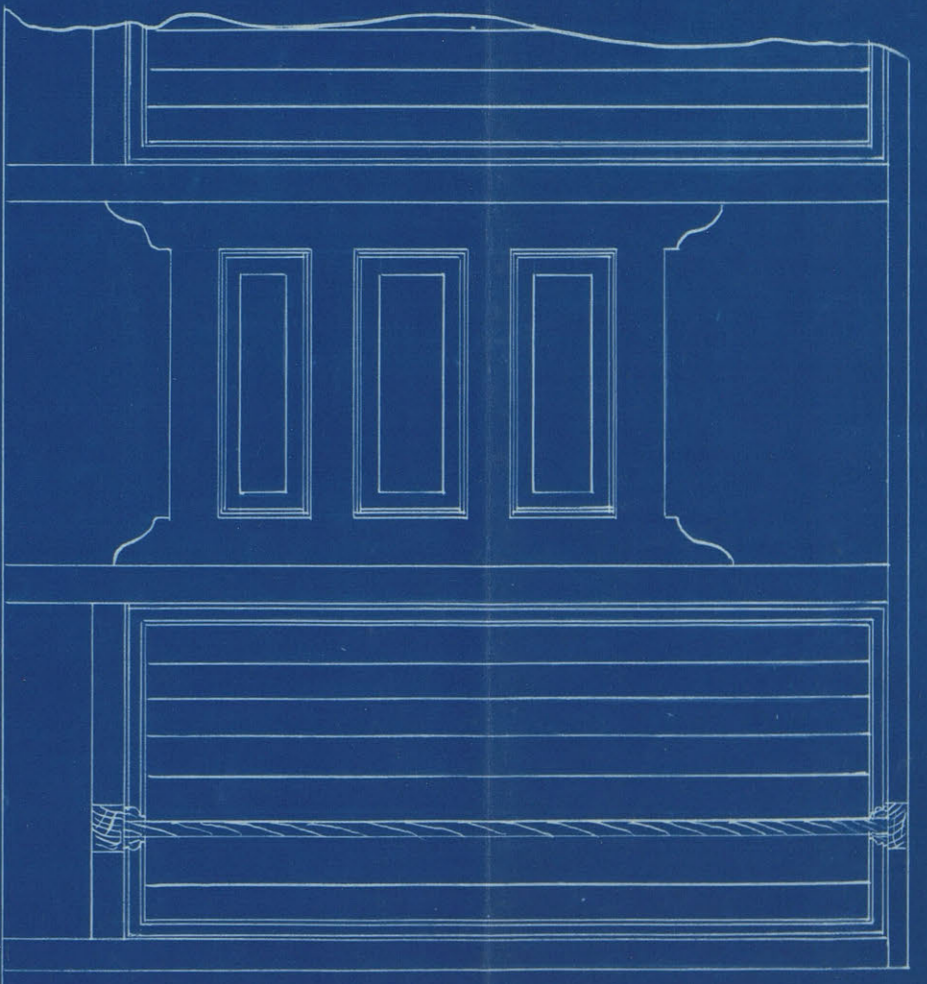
DETAIL OF COLUMN AND GIRDER IN BASEMENT 1/2"=1'
